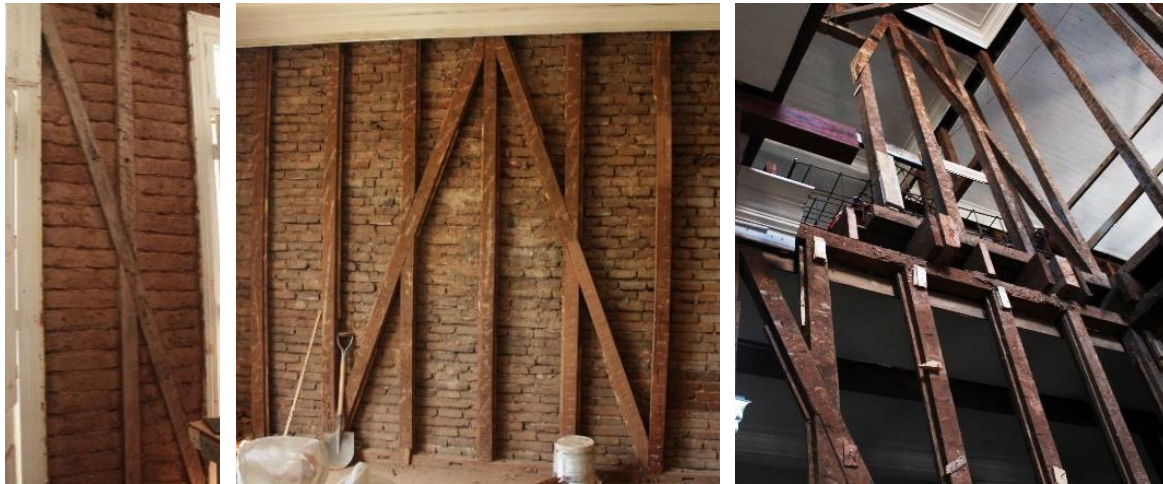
(a) Elementary cell. (b) Shear wall. (c) Shear walls and timber stories. (Jiménez, 2015)
